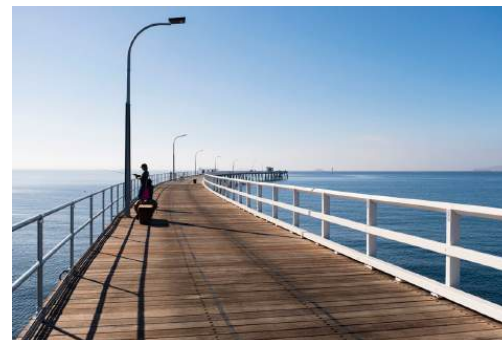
View of "Heritage" section of first 75m of Replacement Esperance Jetty showing timber decking and reconstruction balustrade. *H+H Architects, 2022.
